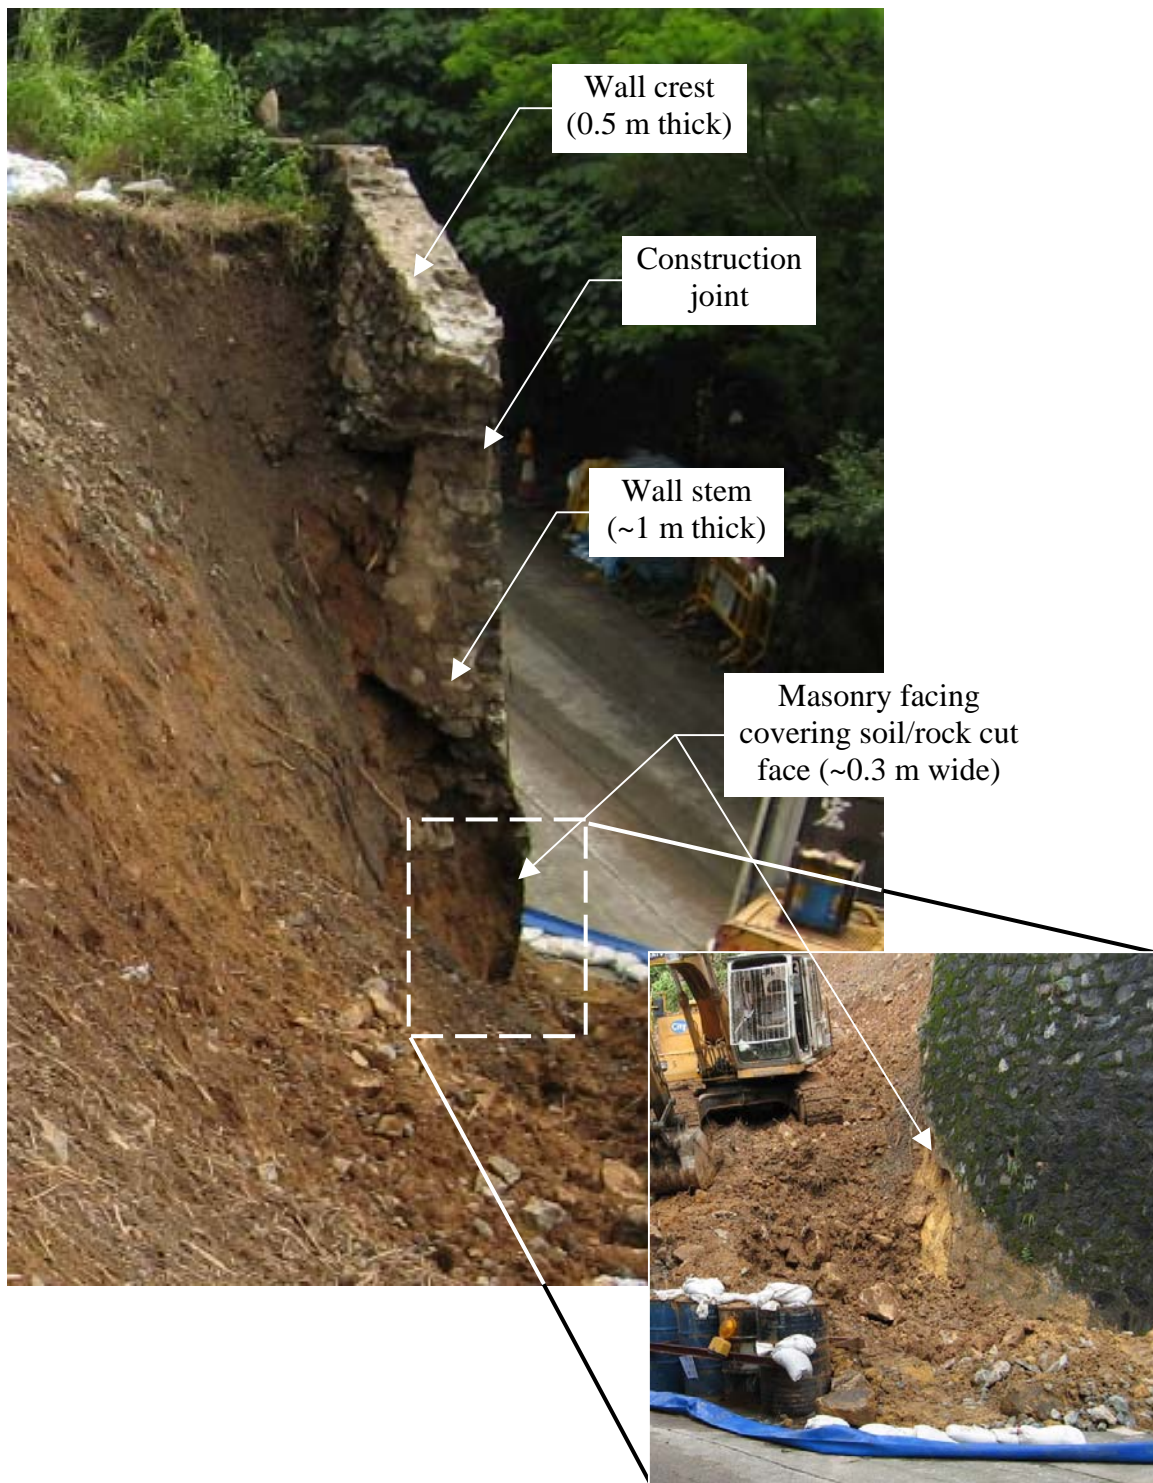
Close-up View of the Exposed Wall Stem and Masonry Facing at Wall Toe
